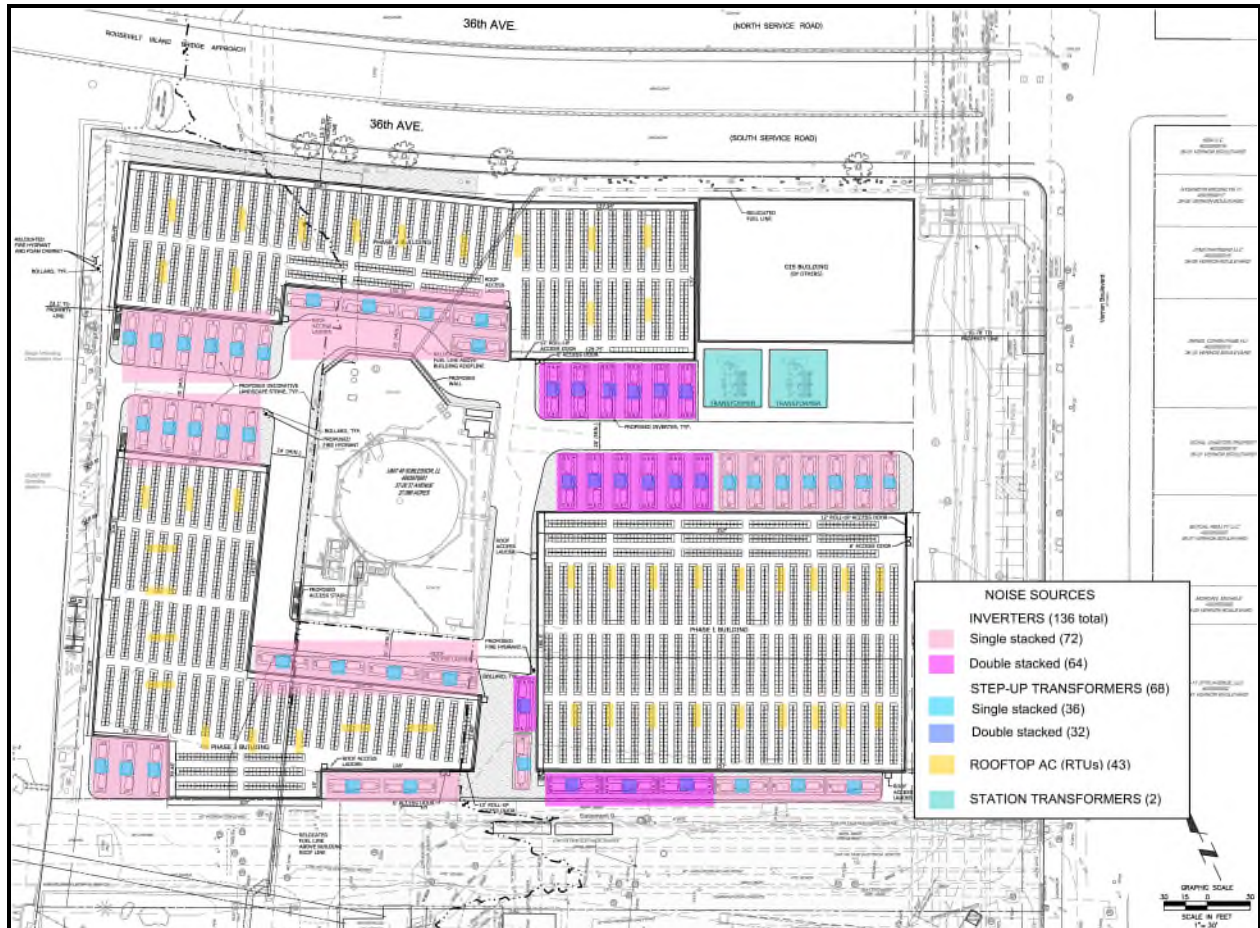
Ravenswood Battery Storage Facility Noise Sources
